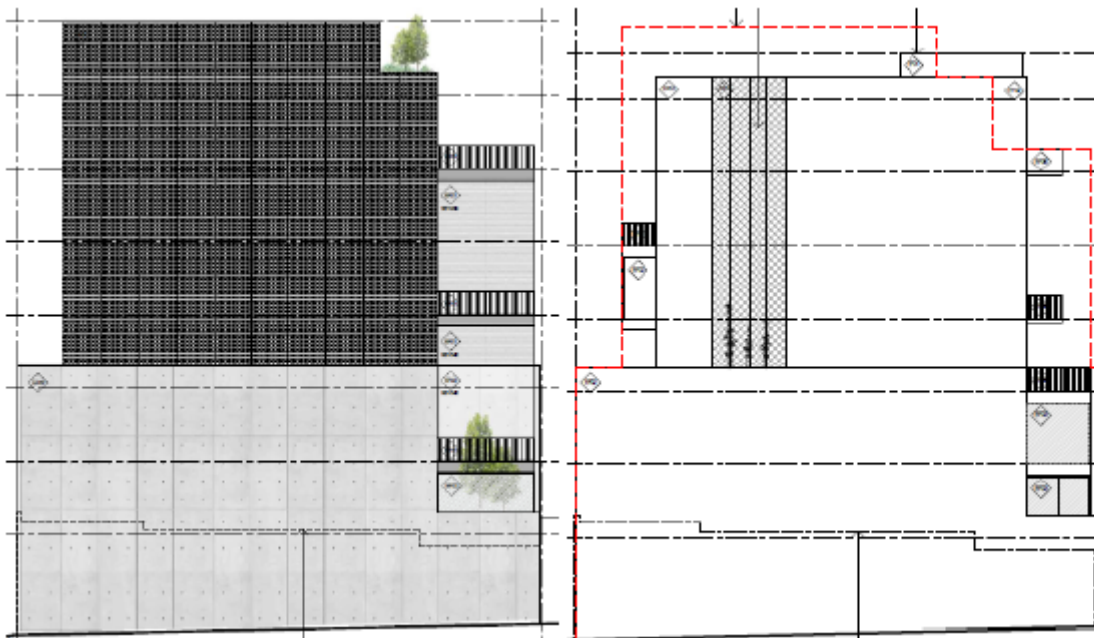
3D of the revised northern façade (decision plan on the left and sketch plan on right)
